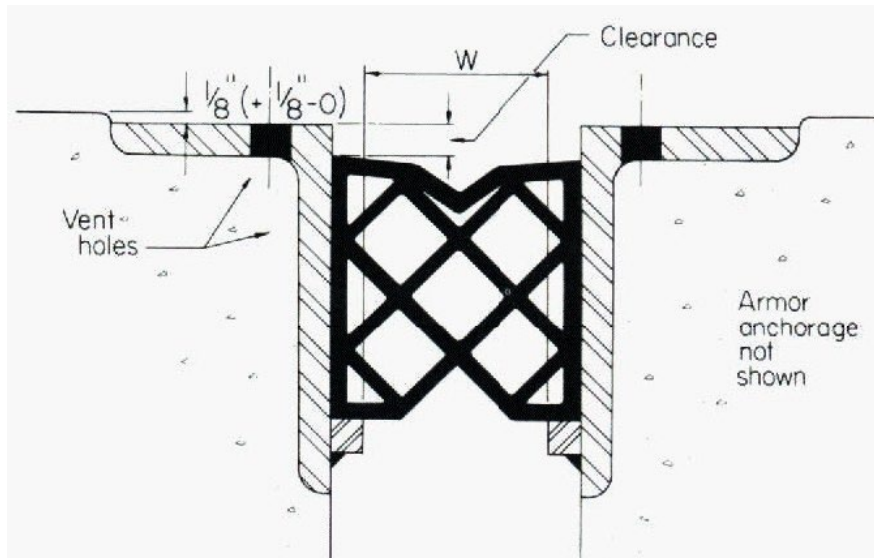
Cross Section of a Compression Joint Seal with Steel Angle Armoring
